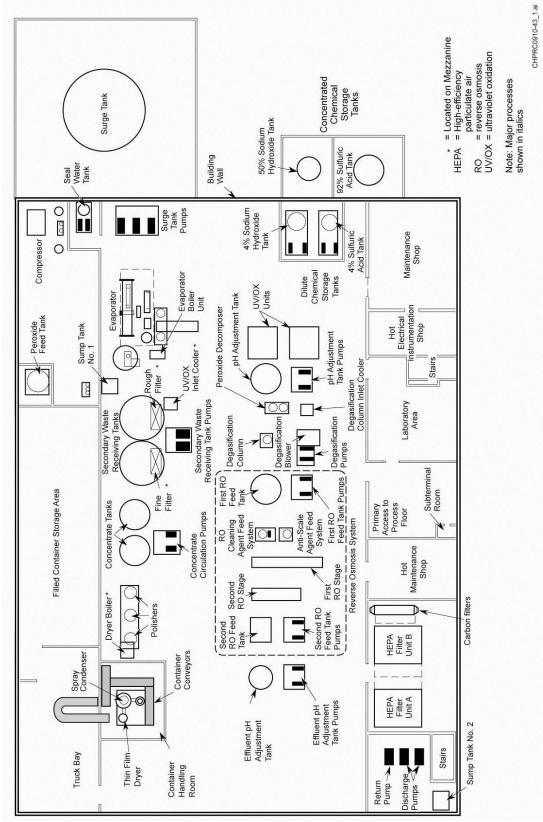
200 Area Effluent Treatment Facility Floor Plan
